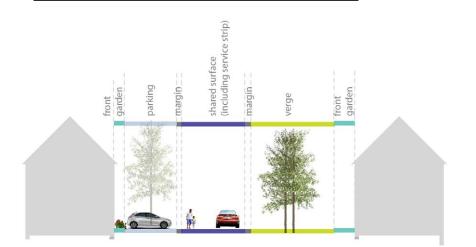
ILLUSTRATIVE GREEN STREET SECTION
